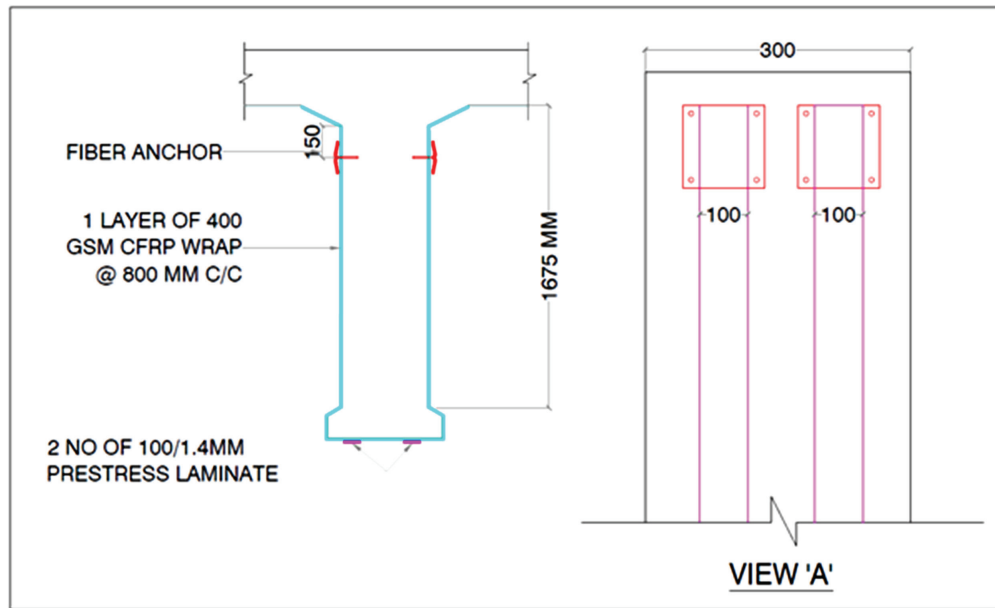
Strengthening of Girder with FRP Laminate and U-wrap (Sectional Elevation)
